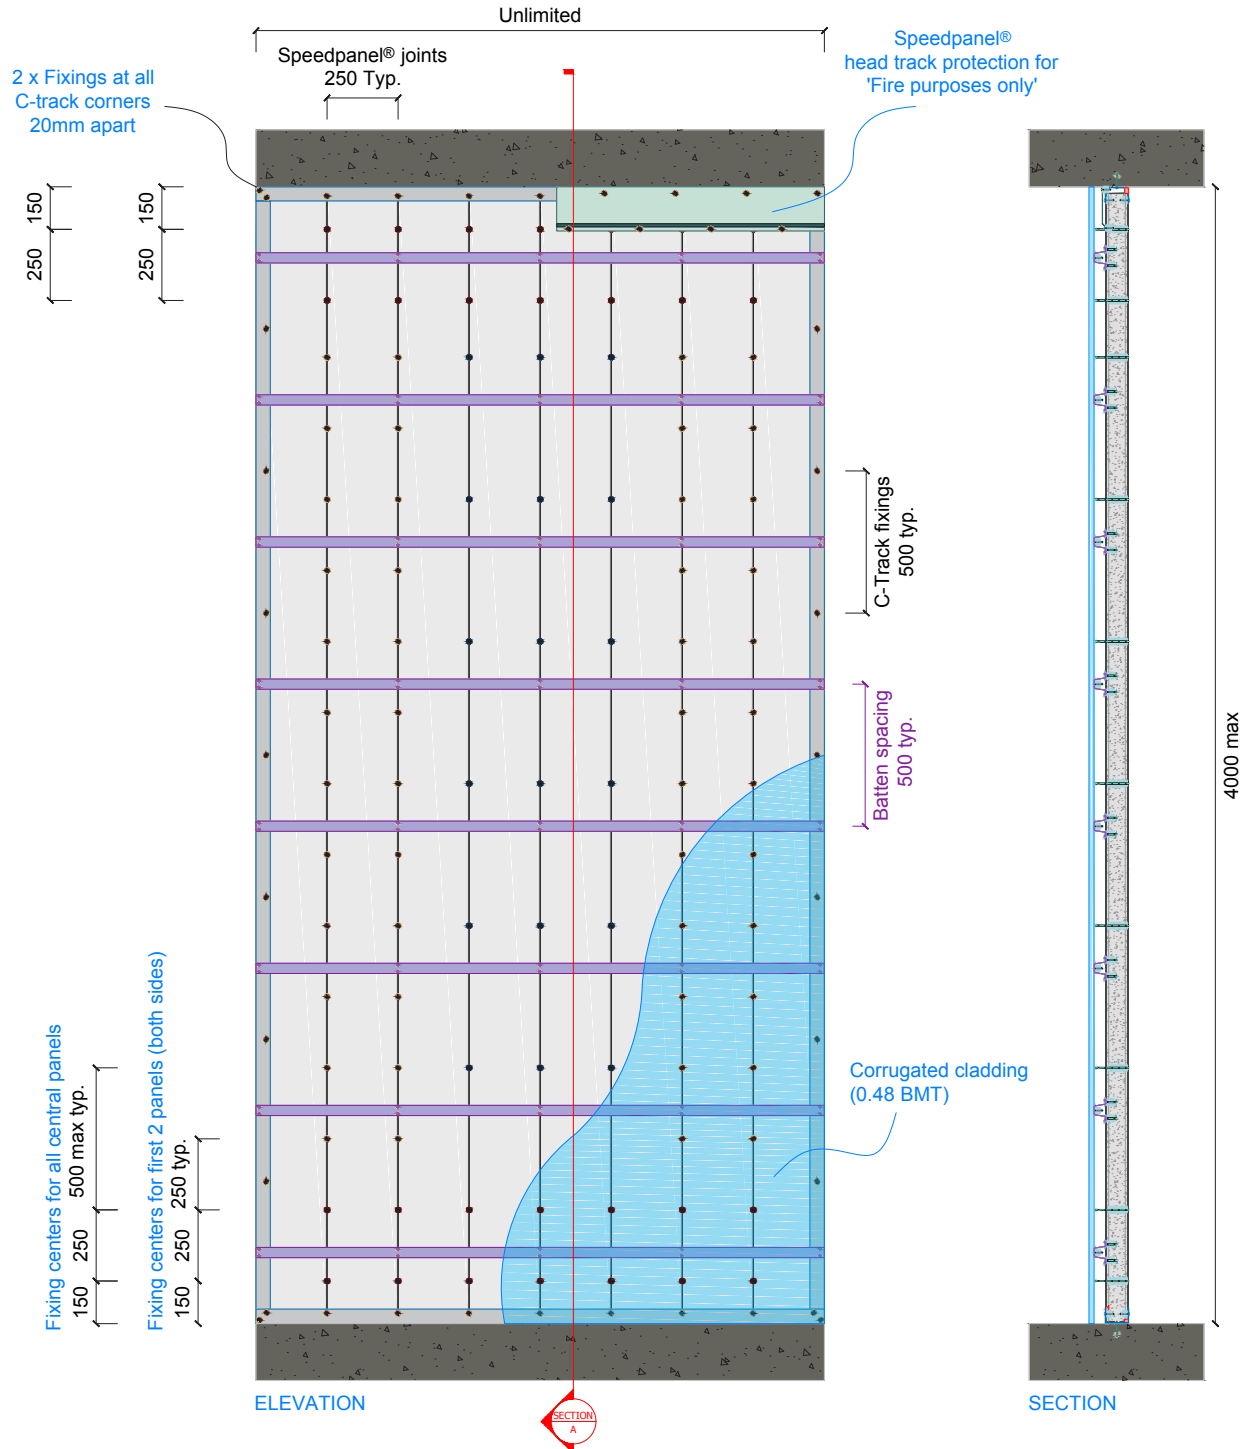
SYSTEM 'D' (ELEVATION & SECTION SYSTEM FIXING LOCATIONS & SPACINGS (CENTRE TO CENTRE))
